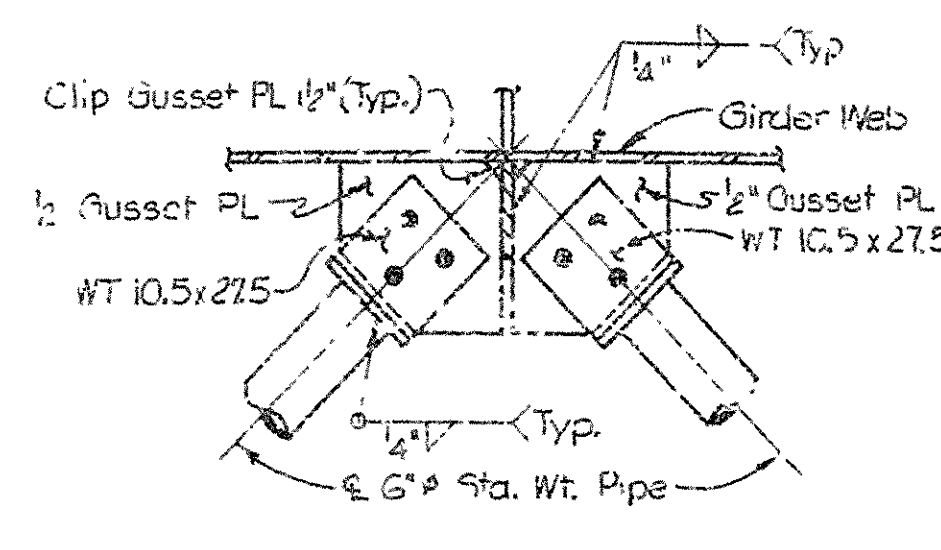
DETAILS OF UPPER CROSS FRAME CONNECTIONS
